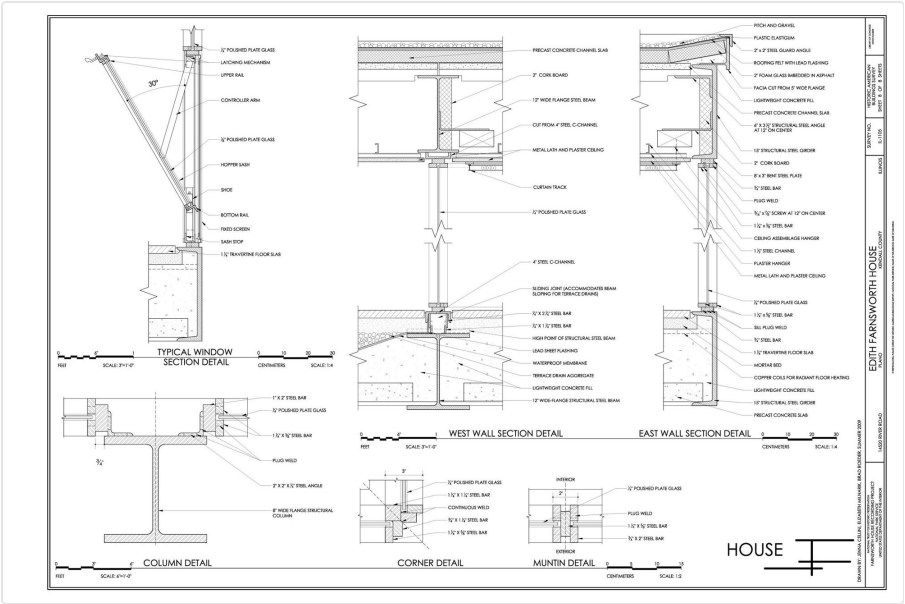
What "detail" used to mean. Wall, window and column details of the Farnsworth House (2009 survey): typical window section, wall sections and corner details. In a BIM process much of this information moves into the model elements themselves, which is what the higher levels of development describe.
